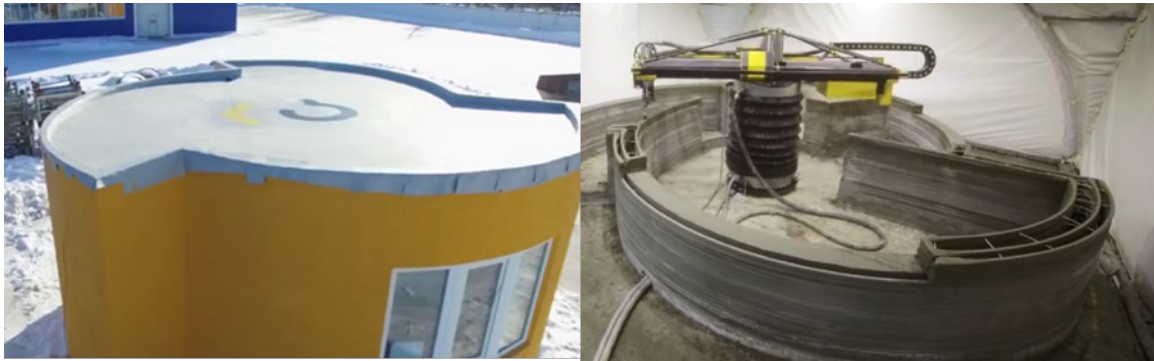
Residential house 3D-concrete printed on site by Apis Cor
